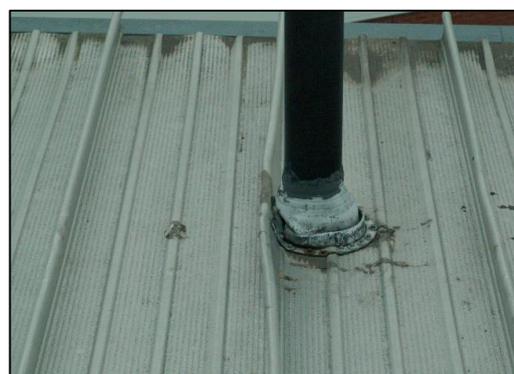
Poor site detail for SVP penetration (Hicks, 2013)
